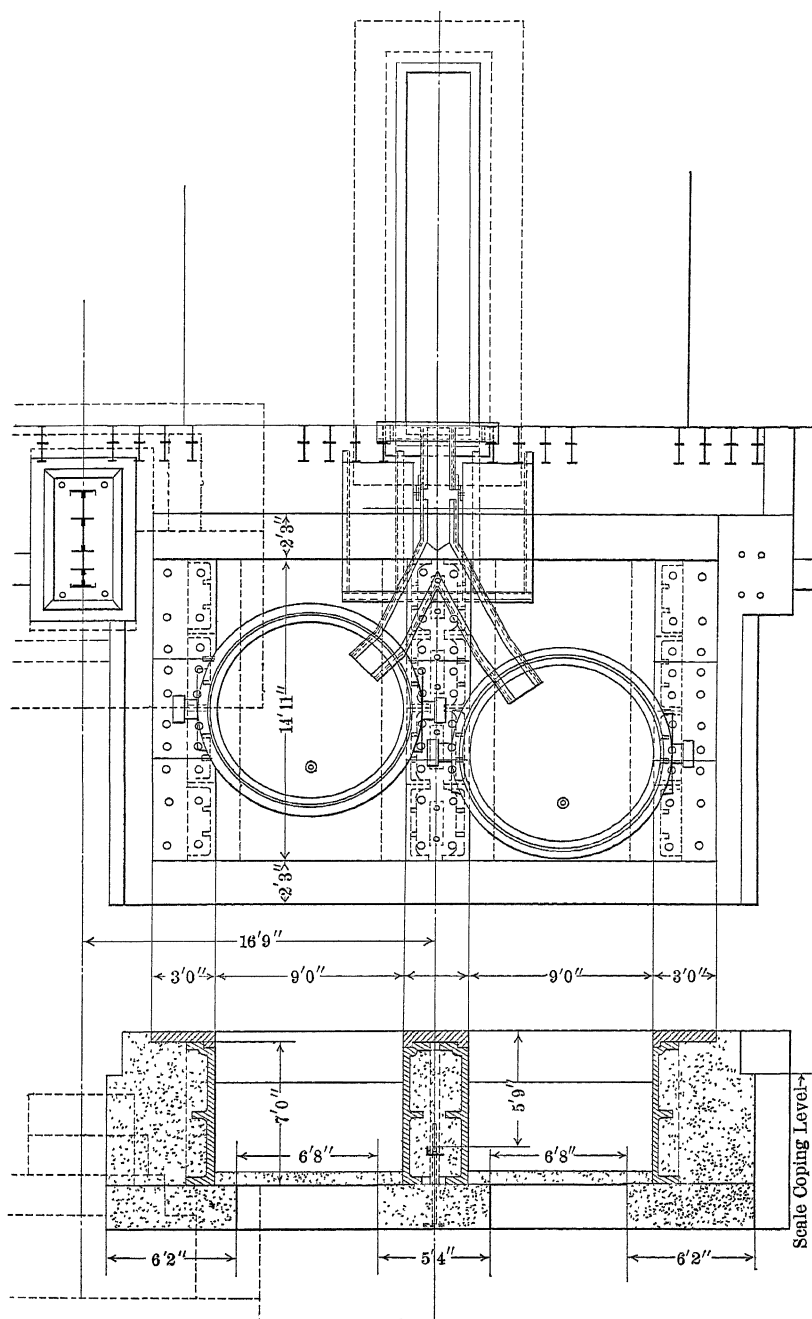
GENERAL PLAN OF TWIN LADLE-PIT AND SPOUT FOR OPEN-HEARTH FURNACES.
